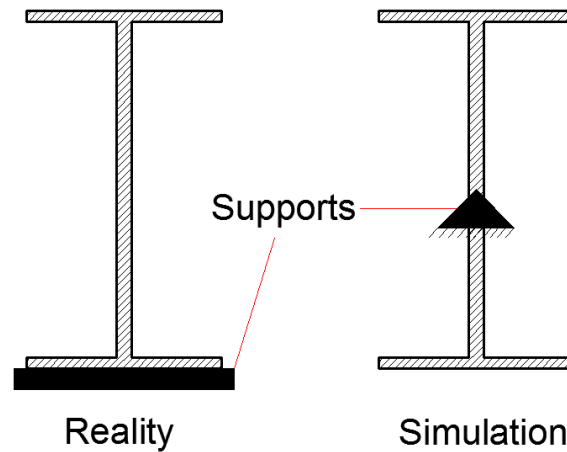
A cross section of the studied beam at place of the support, uncertainty because of support place in case of using beam elements to model the beam
